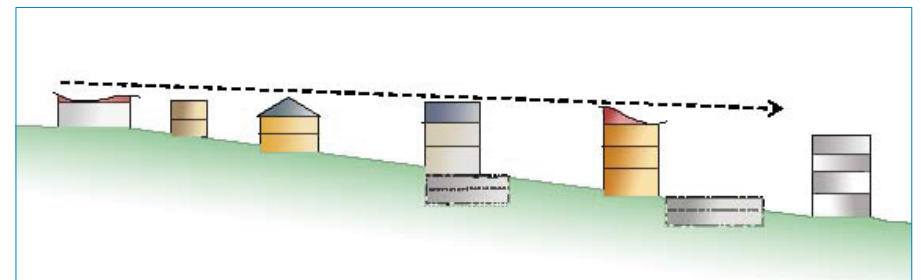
Grade building heights from low in north to higher in south to avoid development projecting above natural ridge on approach from north.
